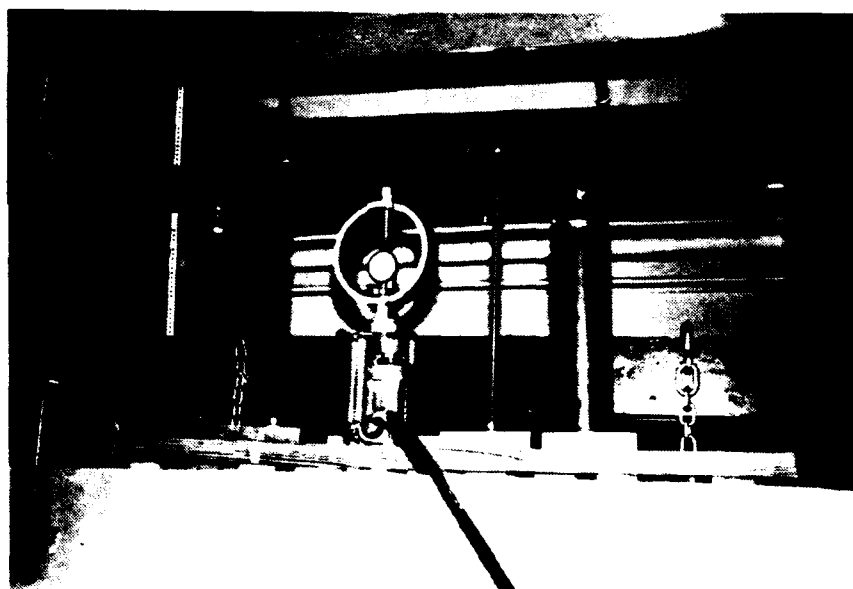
Post-Tensioning System on Top Wall Panel.
